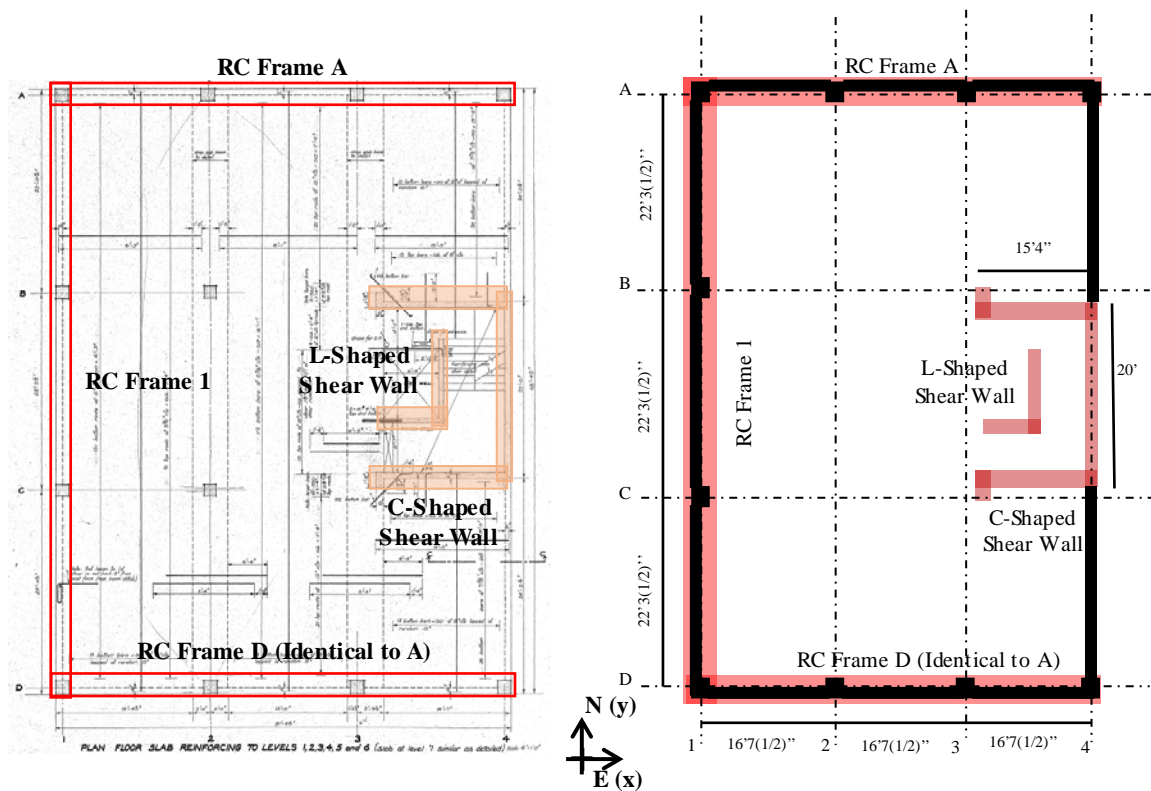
Ground floor plan view of the case study building with illustration of structural systems (Chen 2015).
